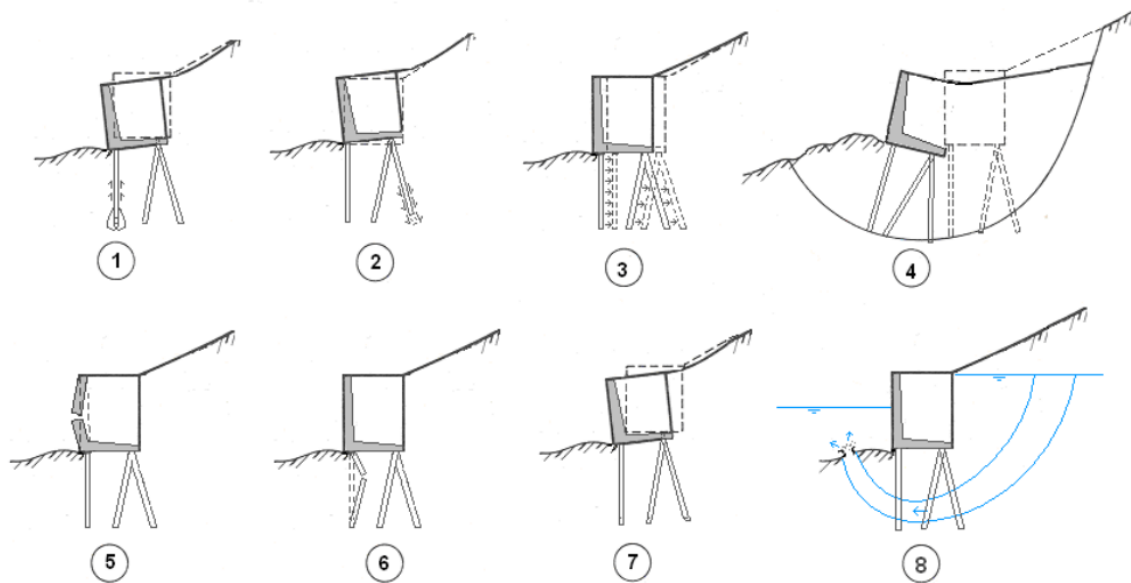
Failure mechanisms of a retaining wall on pile foundations (De Gijt and Roubos, 2013).
